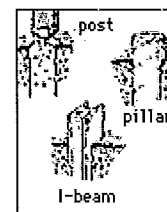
You can minimize damage to trees near foundations by using posts, pillars, or I-beams rather than foundation walls.
